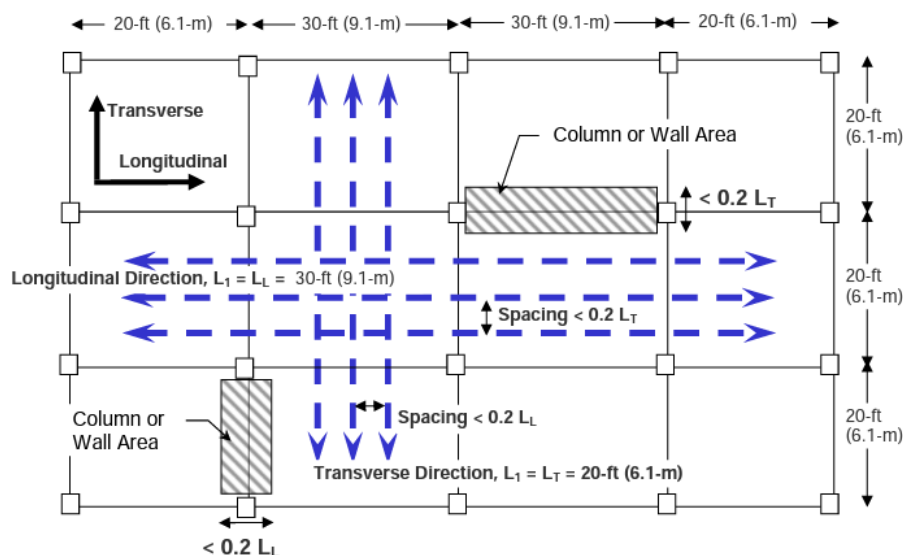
Determination of  $L_1$  and column area for Frame and two-way span Load-bearing wall construction [29]
